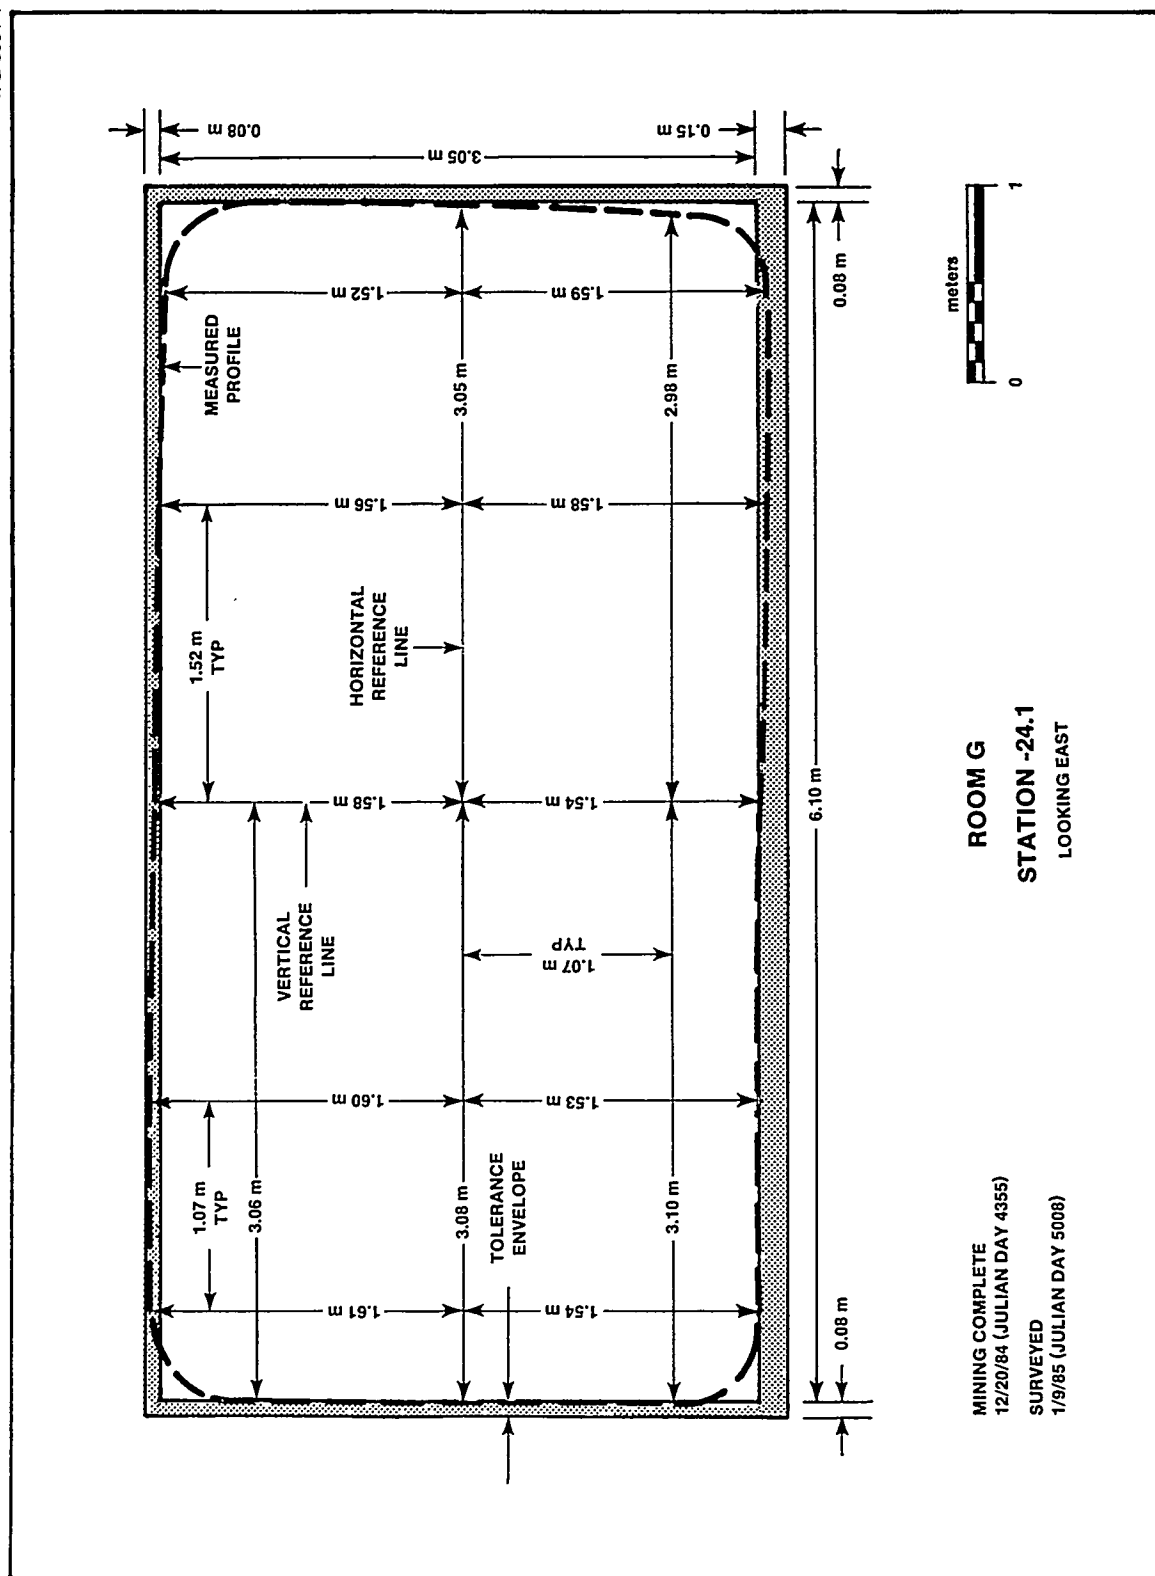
As-Built Cross Section of Station -24.1 m, Room G
